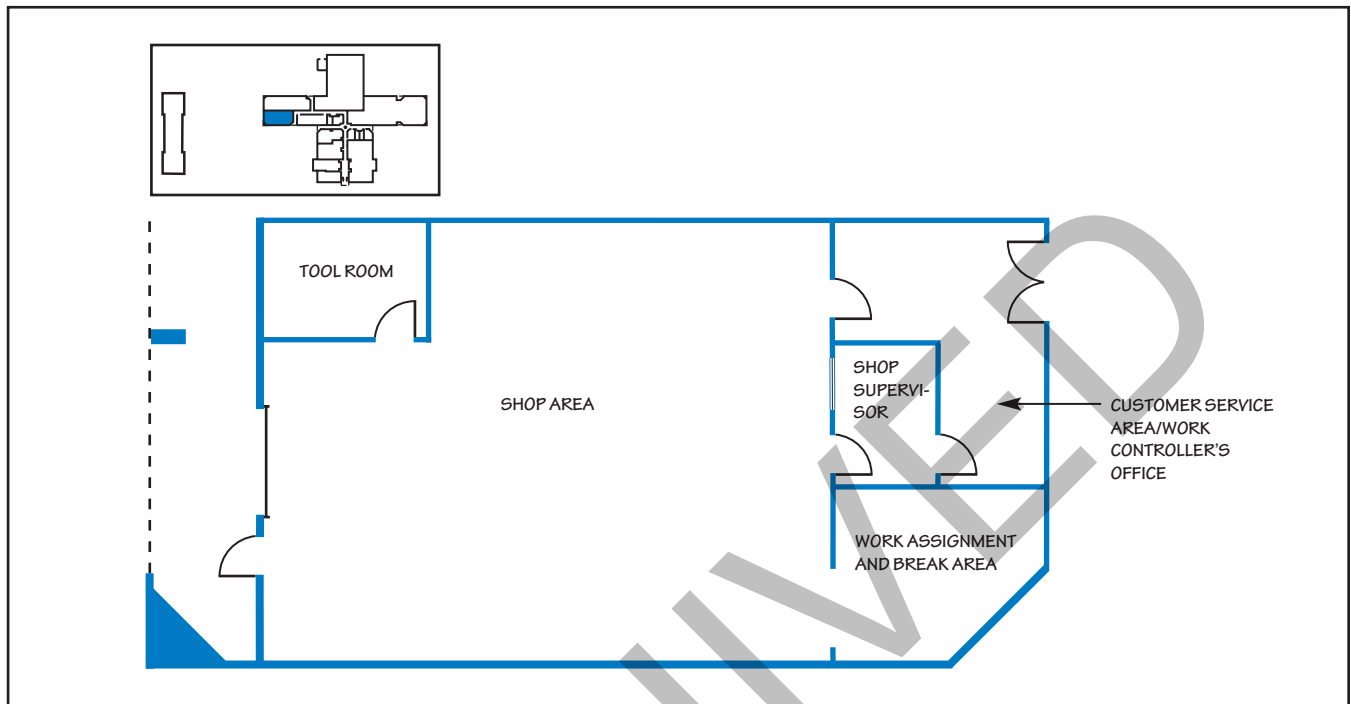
I: Zonal Maintenance Shop Concept Floor Plan.
